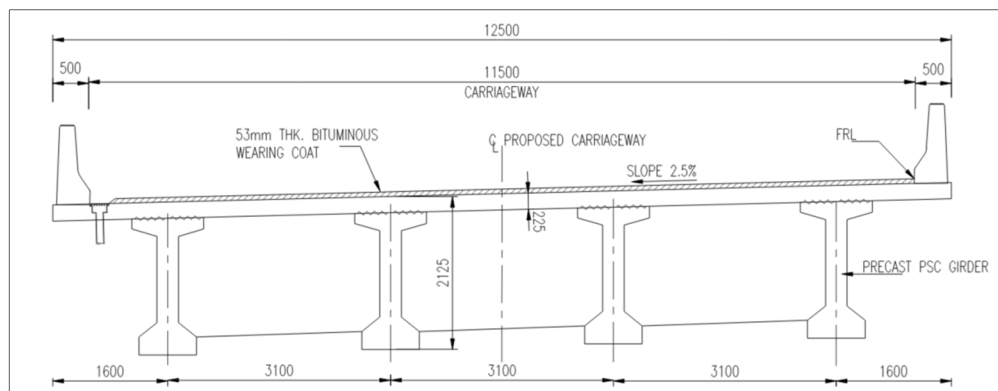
Cross section layout of the bridge superstructure at midspan location
